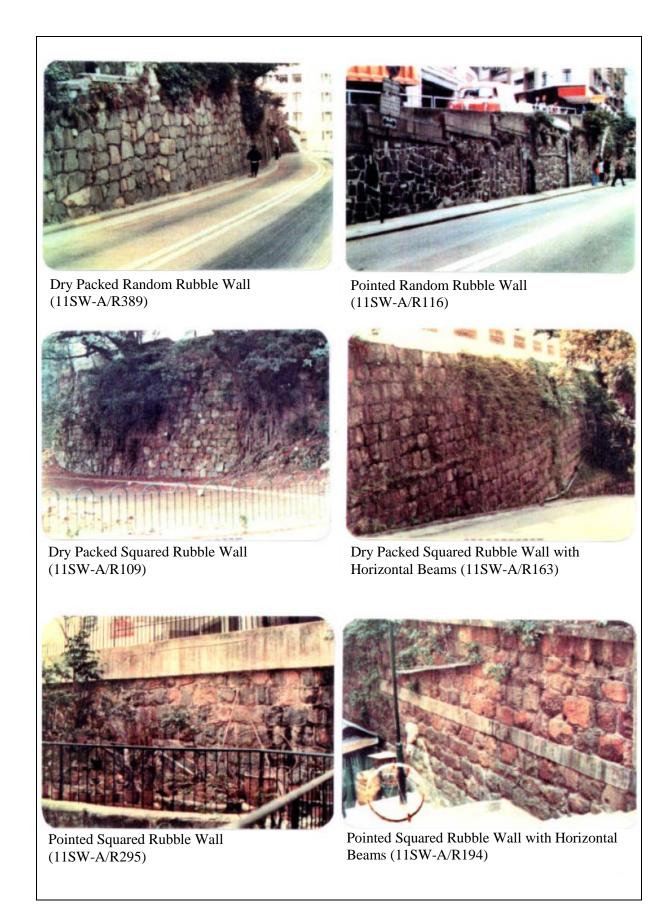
Common Types of Masonry Walls and Masonry Facings (Sheet 1 of 3)
